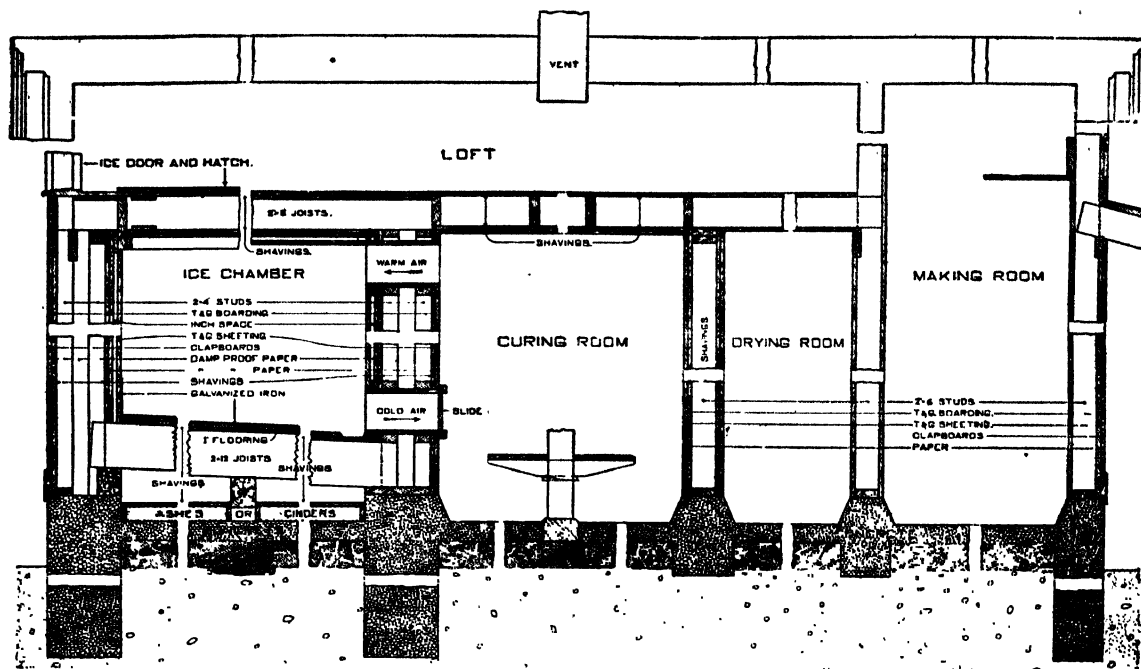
Detail of construction for frame building. (Buildings shown in Figs. 222-227, designed by J. A. Ruddick)
